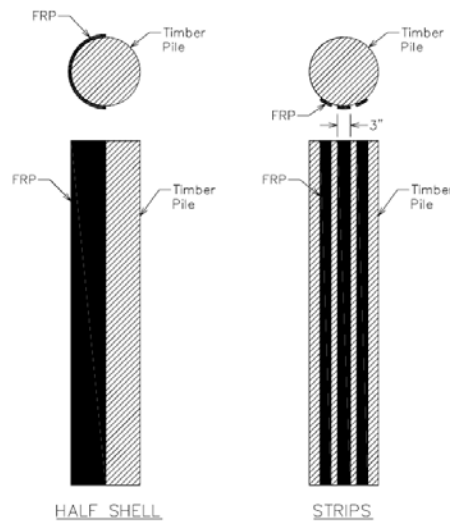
Possible FRP retrofitting configurations for abutment timber piles.
